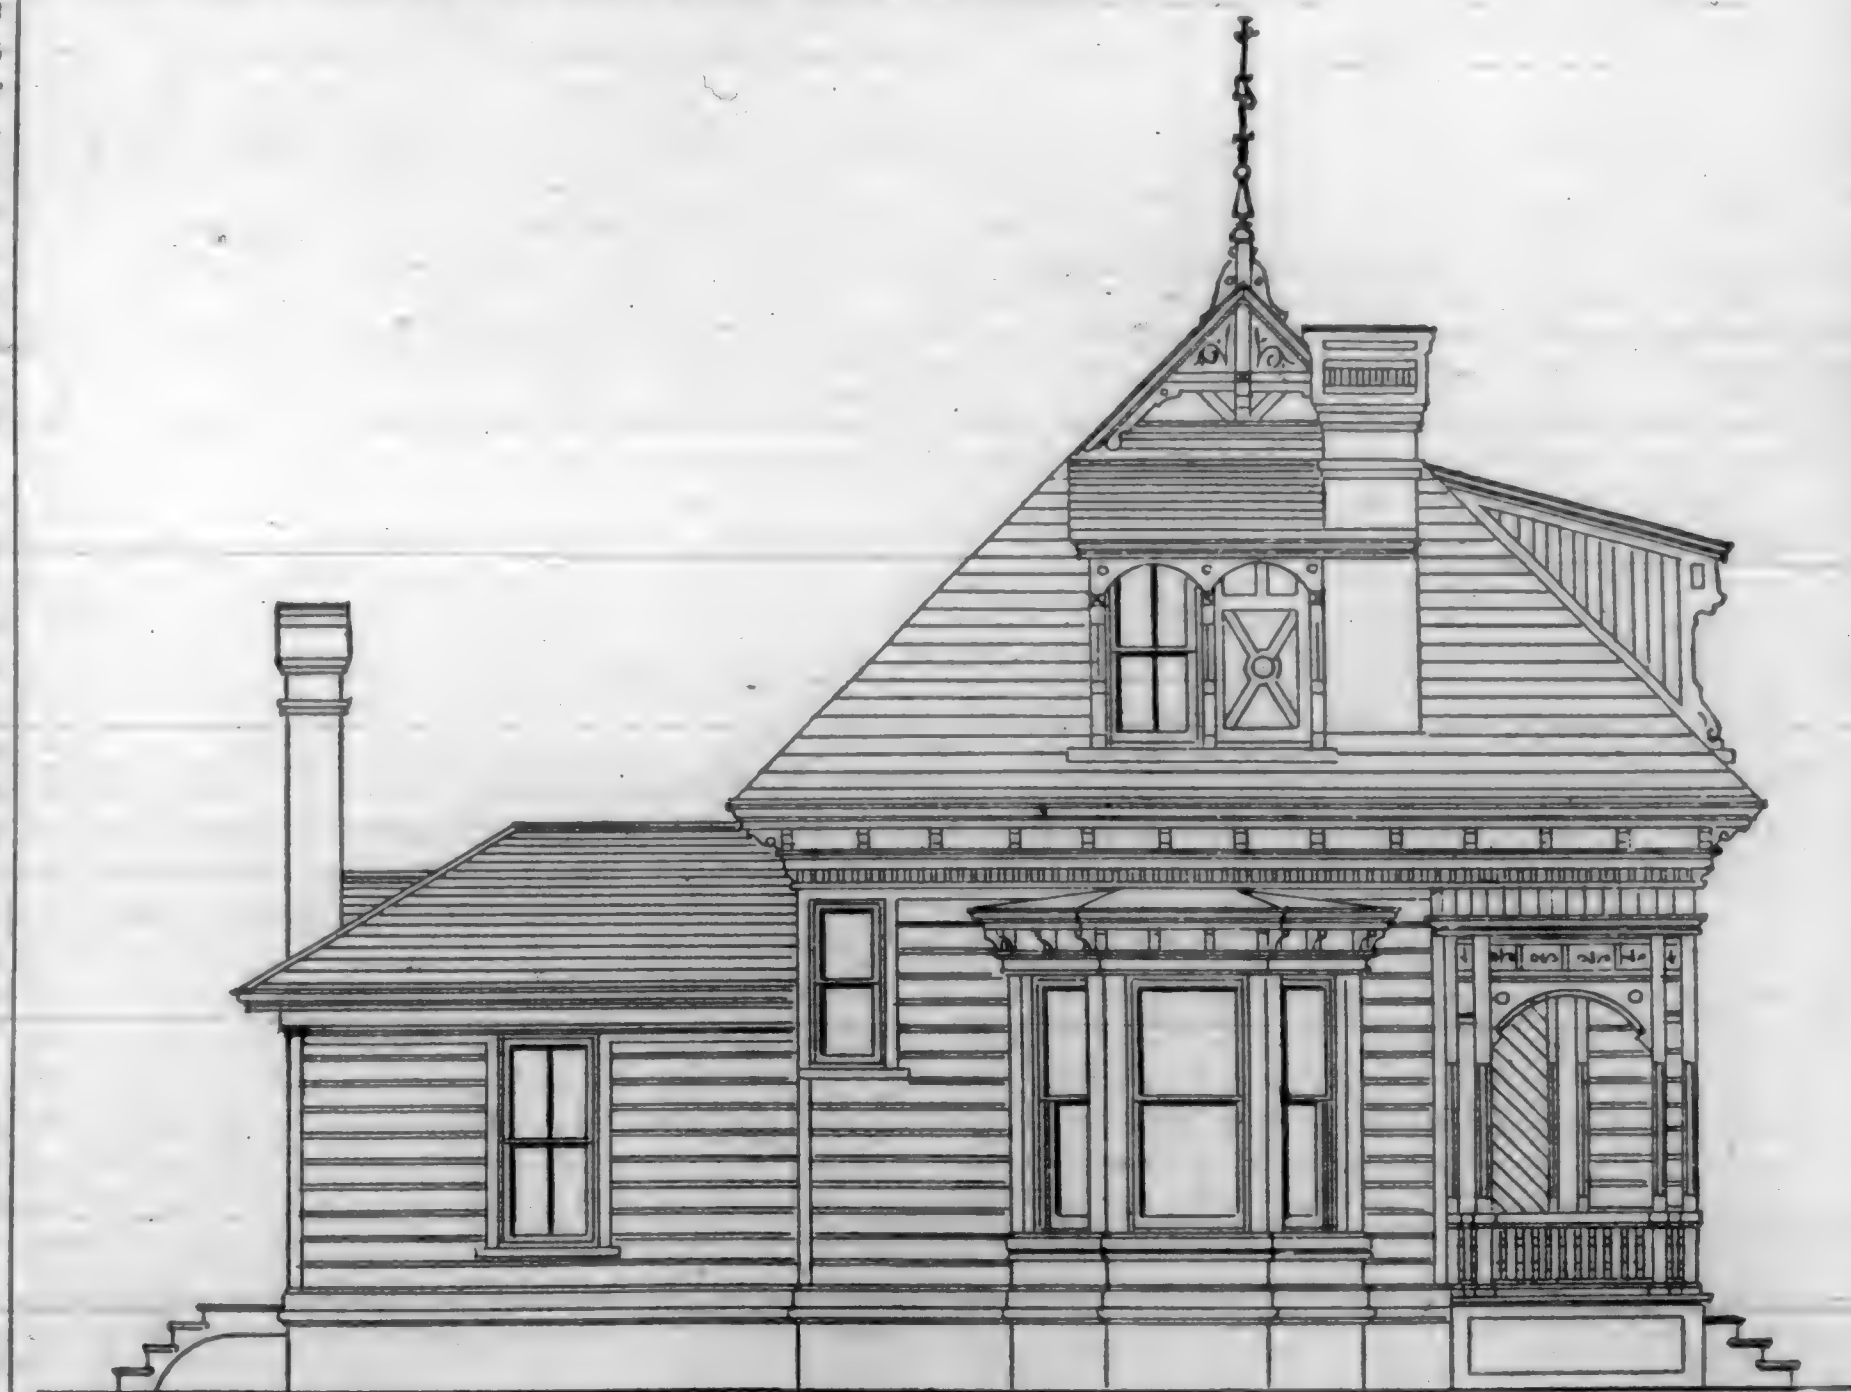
SIDE VIEW \$3,000 DWELLING.
